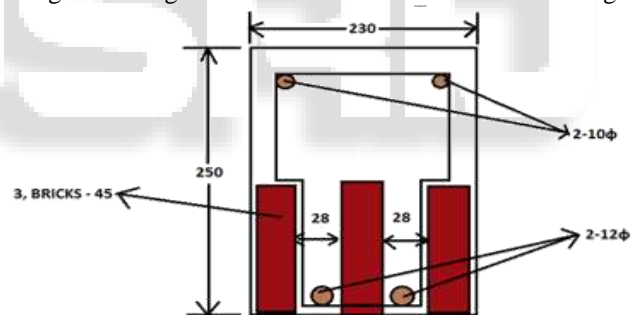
Arrangement of Bricks & Reinforcement of Beam at a Section A-A
